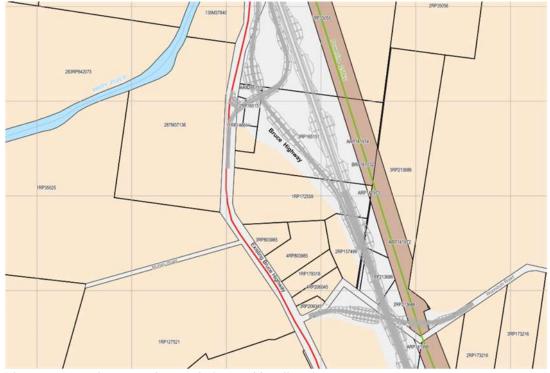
Section D of the new Bruce Highway Upgrade showing the new alignment to bypass Gympie
